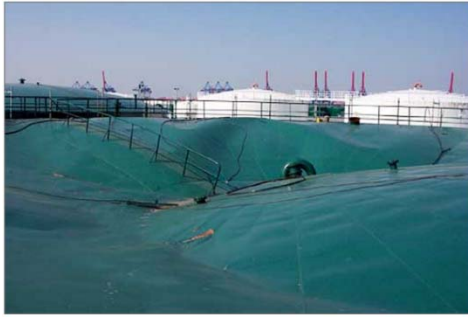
Damage to tank roof caused by wind suction (underpressure).
